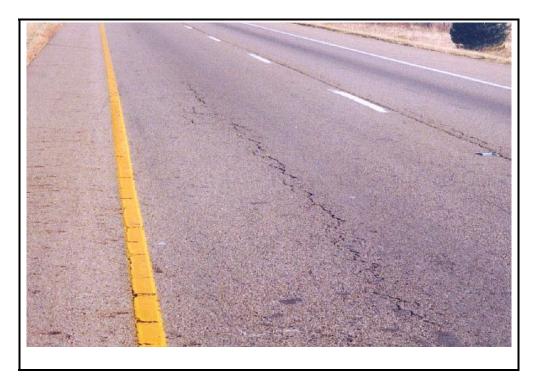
Longitudinal Joint Cracking in Flexible Pavement, Medium Severity
